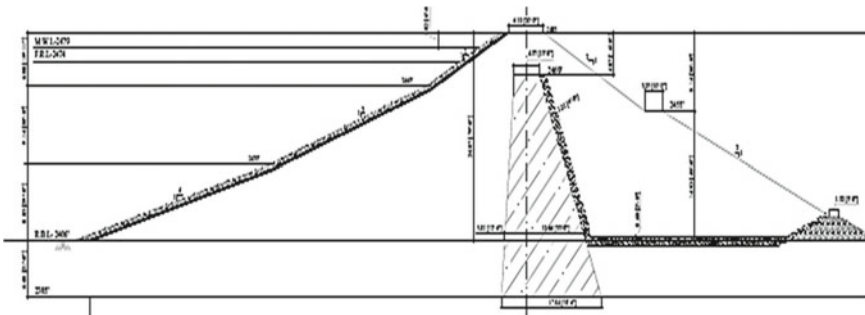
Dam cross section at existing dam section at chainage 1700ft (right bank)
